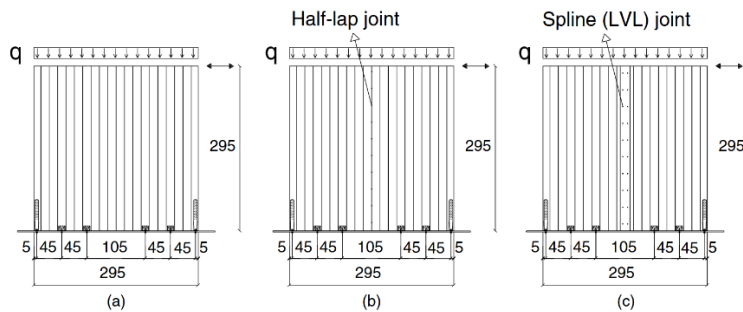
Wall panel test configurations: (a) configuration I—single walls; (b) configuration II—coupled walls with half-lap joint; (c) configuration III—coupled walls with spline (LVL) joint (measures in cm)
